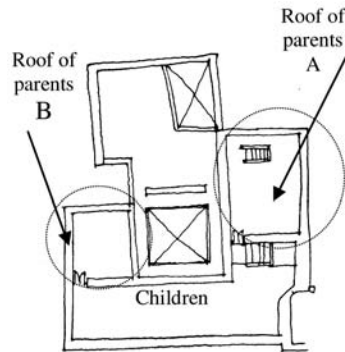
A roof plan shows the division of the roofs. Source: Author.
